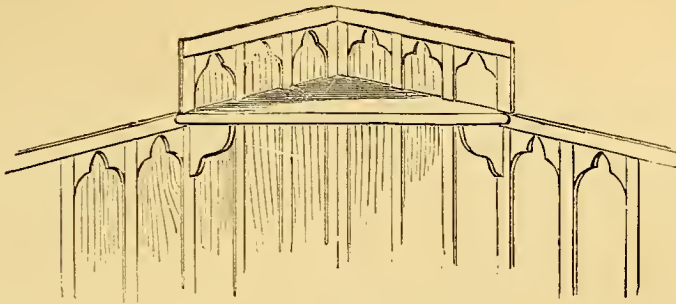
SIMPLE SHELF IN CORNER OF HALL.
